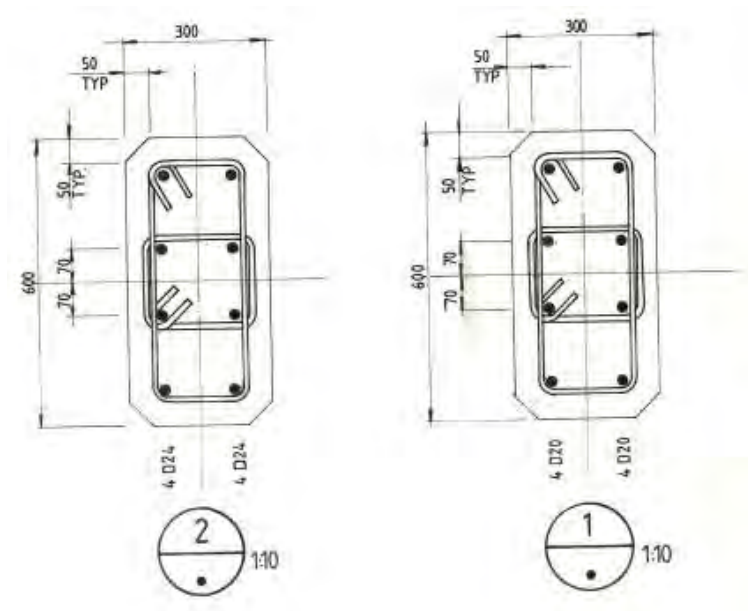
Extract from as-built drawing S6 - showing column reinforcement detail
